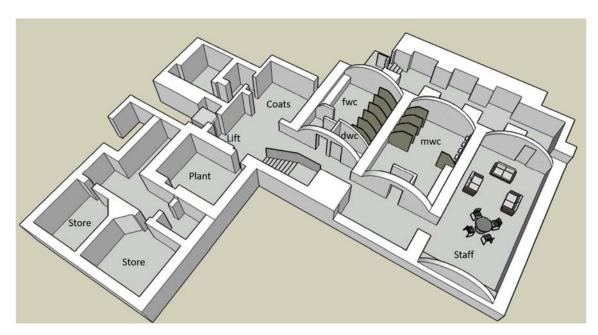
The Basement - refurbished to provide a cloakroom, toilets and staff facilities
